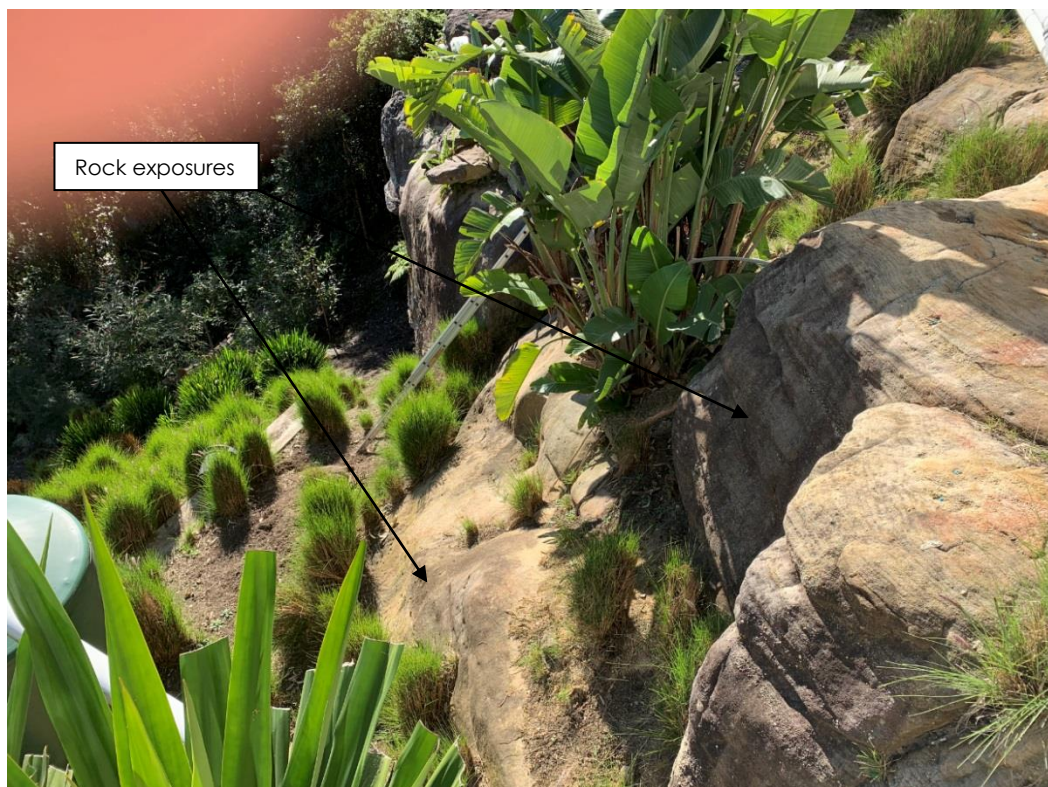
Geotechnical conditions across the proposed development area – looking towards the south
